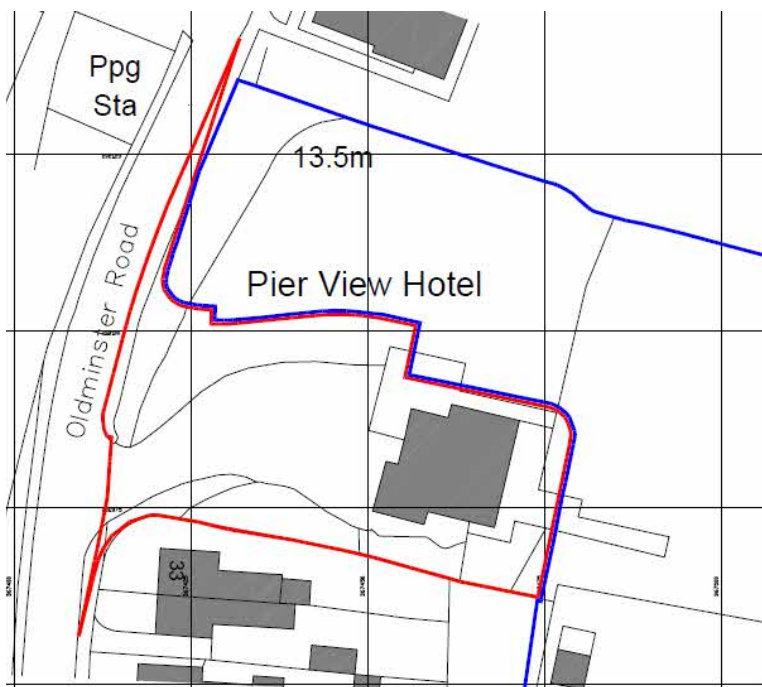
Site Location Plan, with the area of proposed development outlined in red, and the landholdings associated with the former Pier View Hotel outlined in blue.
